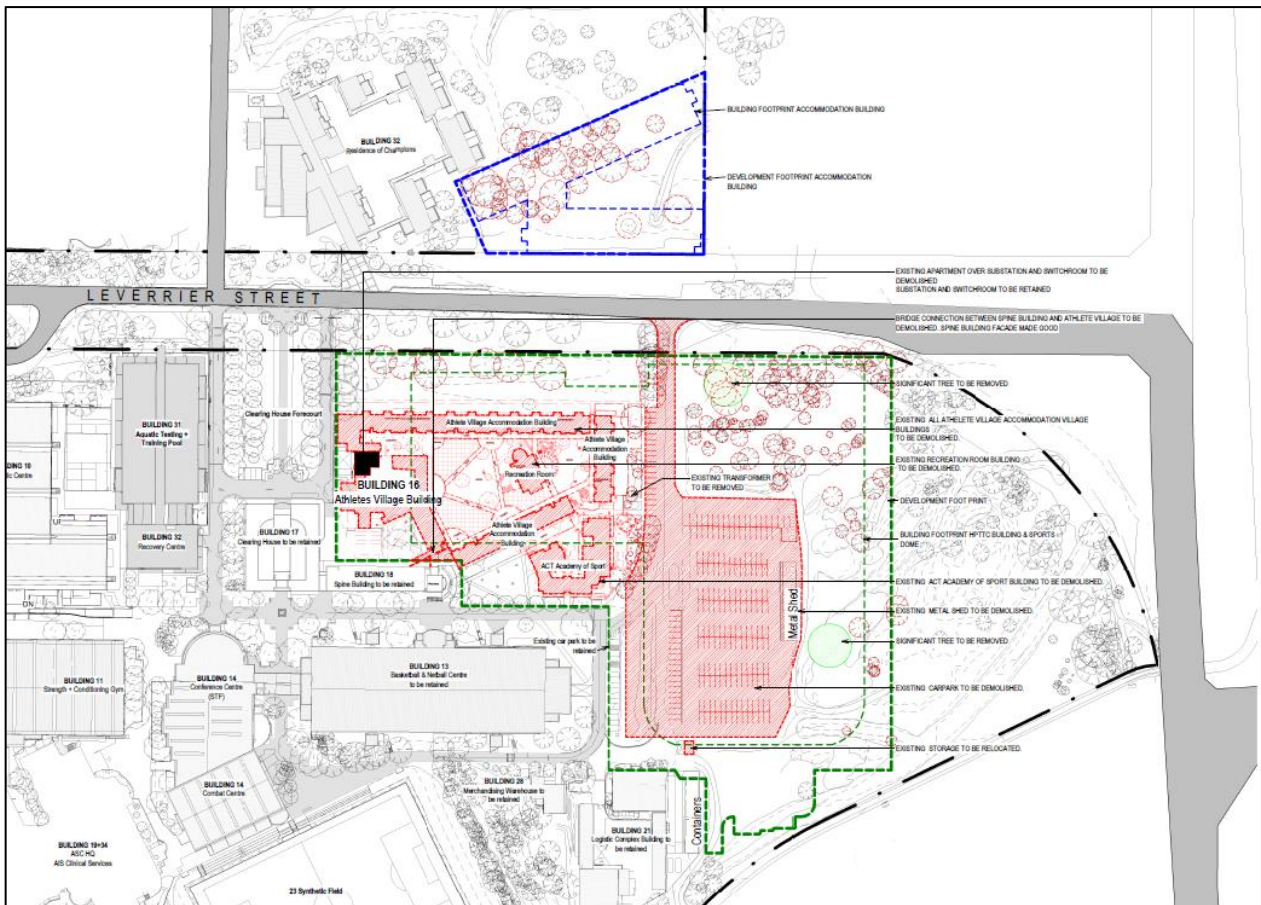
Proposed demolition (source: Populous Existing/Demolition Plan AT-18-0001(B) dated 3/11/25)
